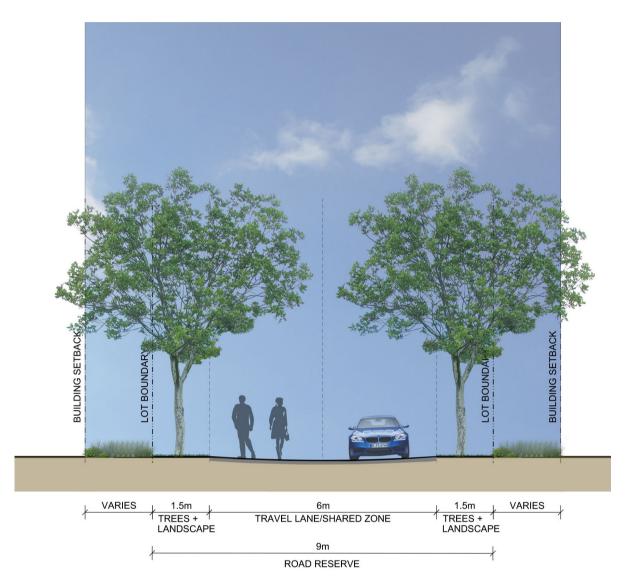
Typical Laneway / Shared Street_Scale 1:100 @ A3
